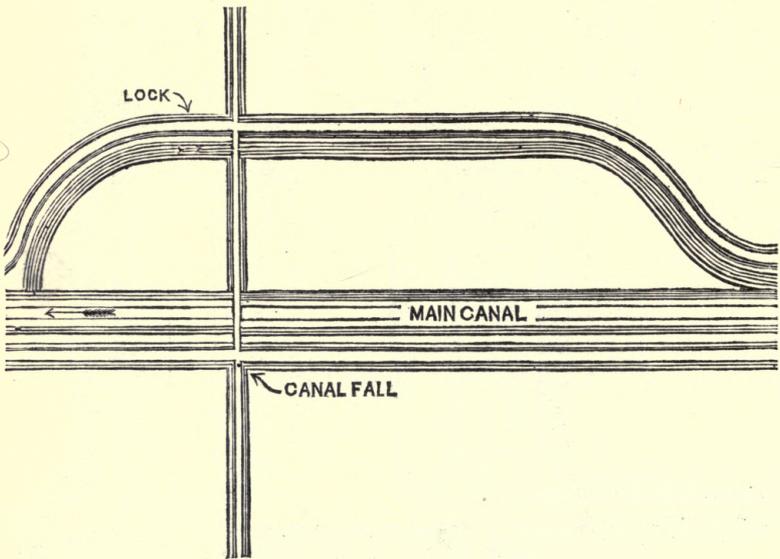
Site Plan of Lock and Fall on Ganjes Canal.
